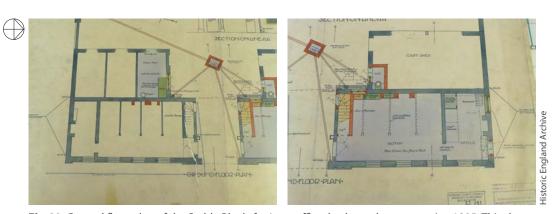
Ground floor plan of the Stable Block, for 'new office, bothy and tenements', c. 1905. This shows a wash house in the south-west corner, and a cart shed in the north-west corner
